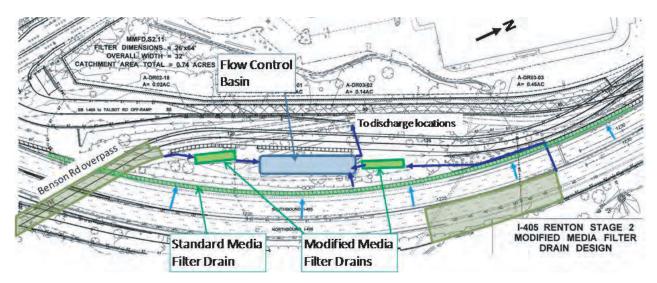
Example layout of MFD and modified MFDs north of Benson Road overpass.
